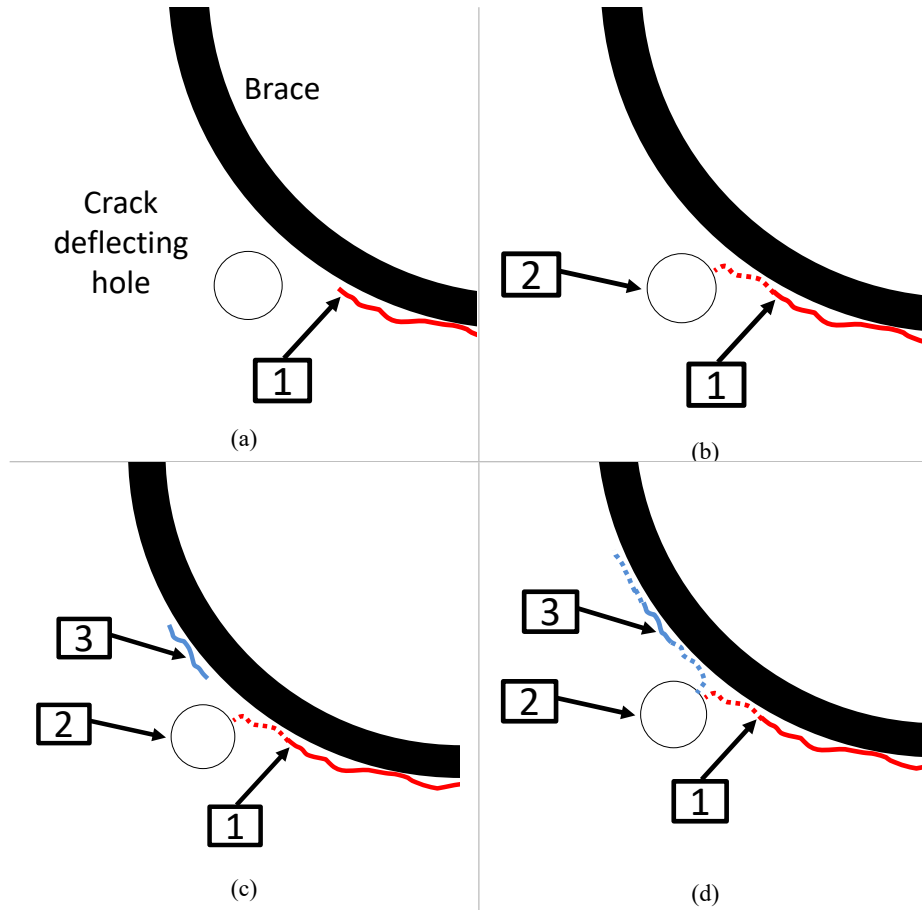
Typical cracking pattern during fatigue testing. The top left-hand figure is indicating the original crack at position 1 and the crack deflecting hole repair. The top right-hand figure indicates the crack developing into the hole (stage a and later b). The bottom left-hand figure shows the formation of the new crack at position 3 beyond the crack arresting hole (stage c), instead of the expected crack development from the hole at position 2. Finally, the bottom right-hand figure shows the new crack entering the hole or coalescing with the original crack (stage d).
